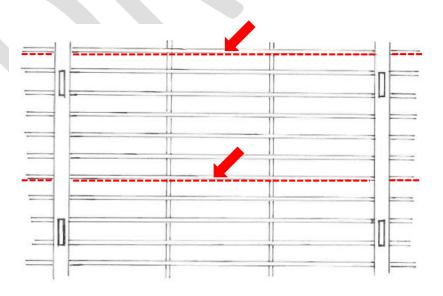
Typical 16m x 7m bay, showing typical crack at original construction joint, along top of rib
